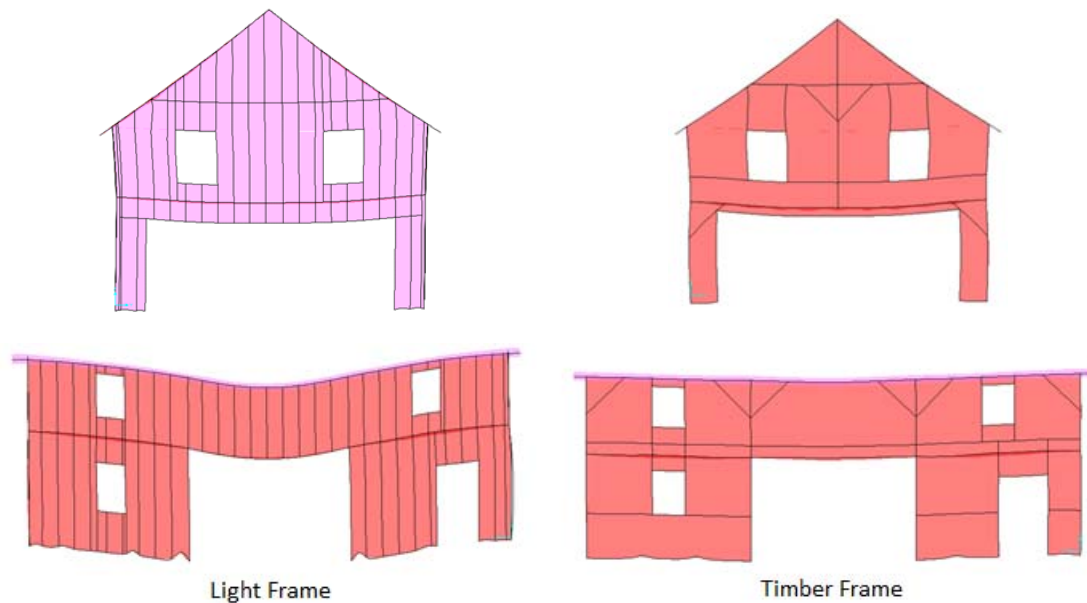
Light-frame and timber frame deflection, respectively, large openings, subjected to gravity loading, load combination 4, deflection scale: 100.
